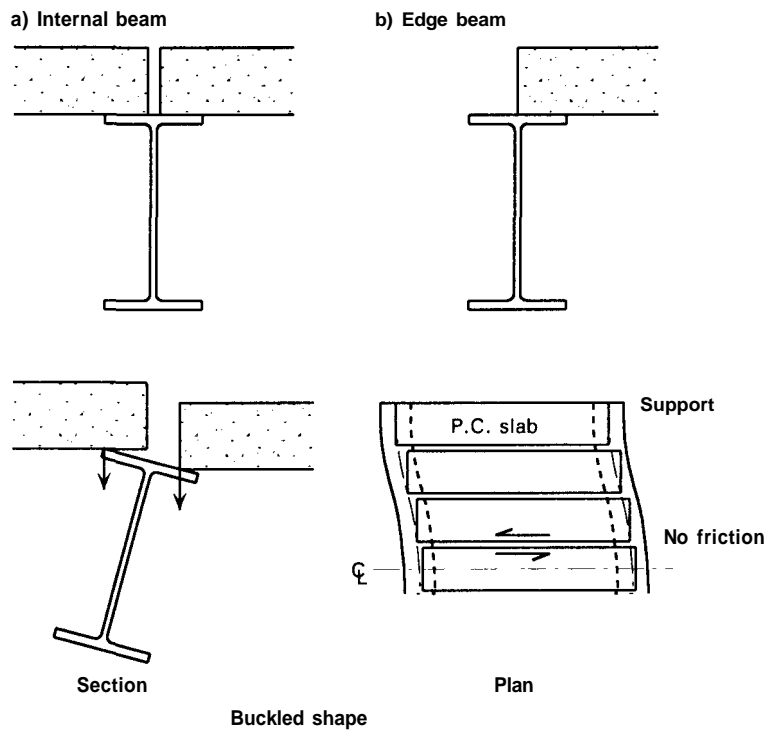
Beam restraint provided by precast concrete slabs
